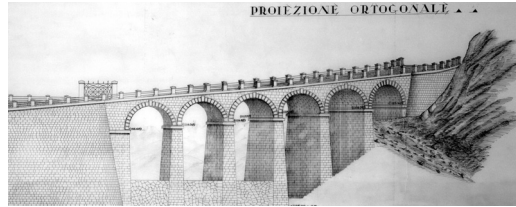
Detail of the original project for a group of great arches supporting the internal street (Archivio Storico Ospedale Morelli).
